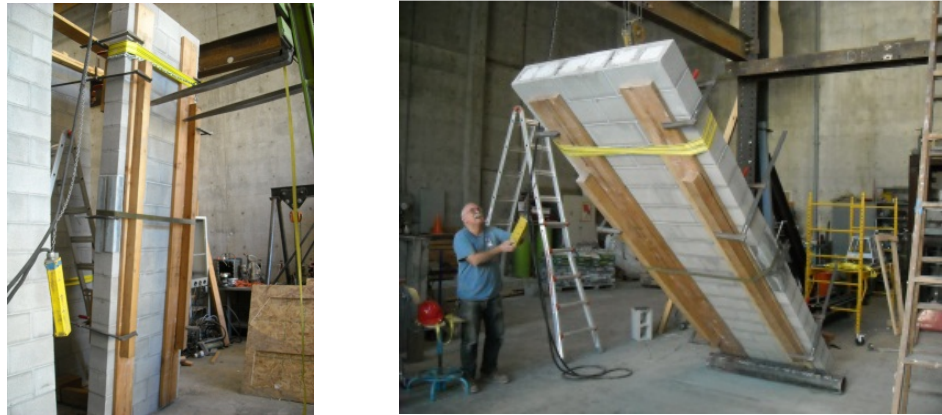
Fork Lift Tilting Wall and (2) Overhead Crane Lowering Wall
